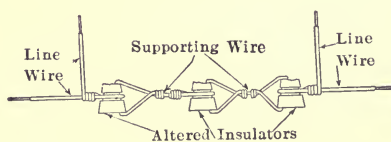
PLAN VIEW OF INSULATOR ARRANGEMENT.
